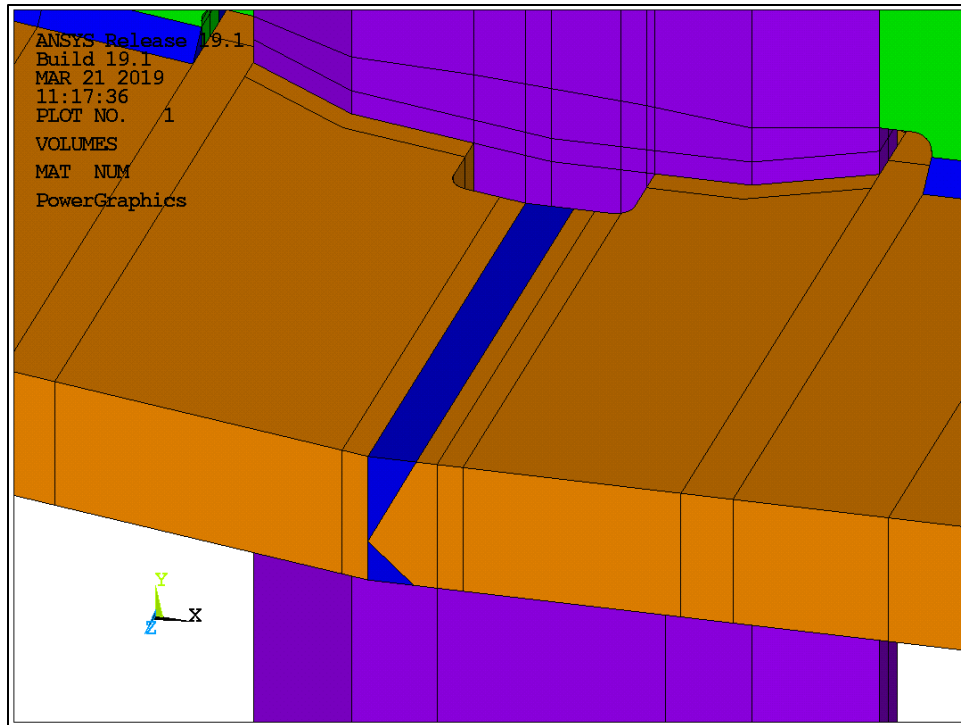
Groove-weld region of Fremont Street solid model (dark blue), bottom flange.
